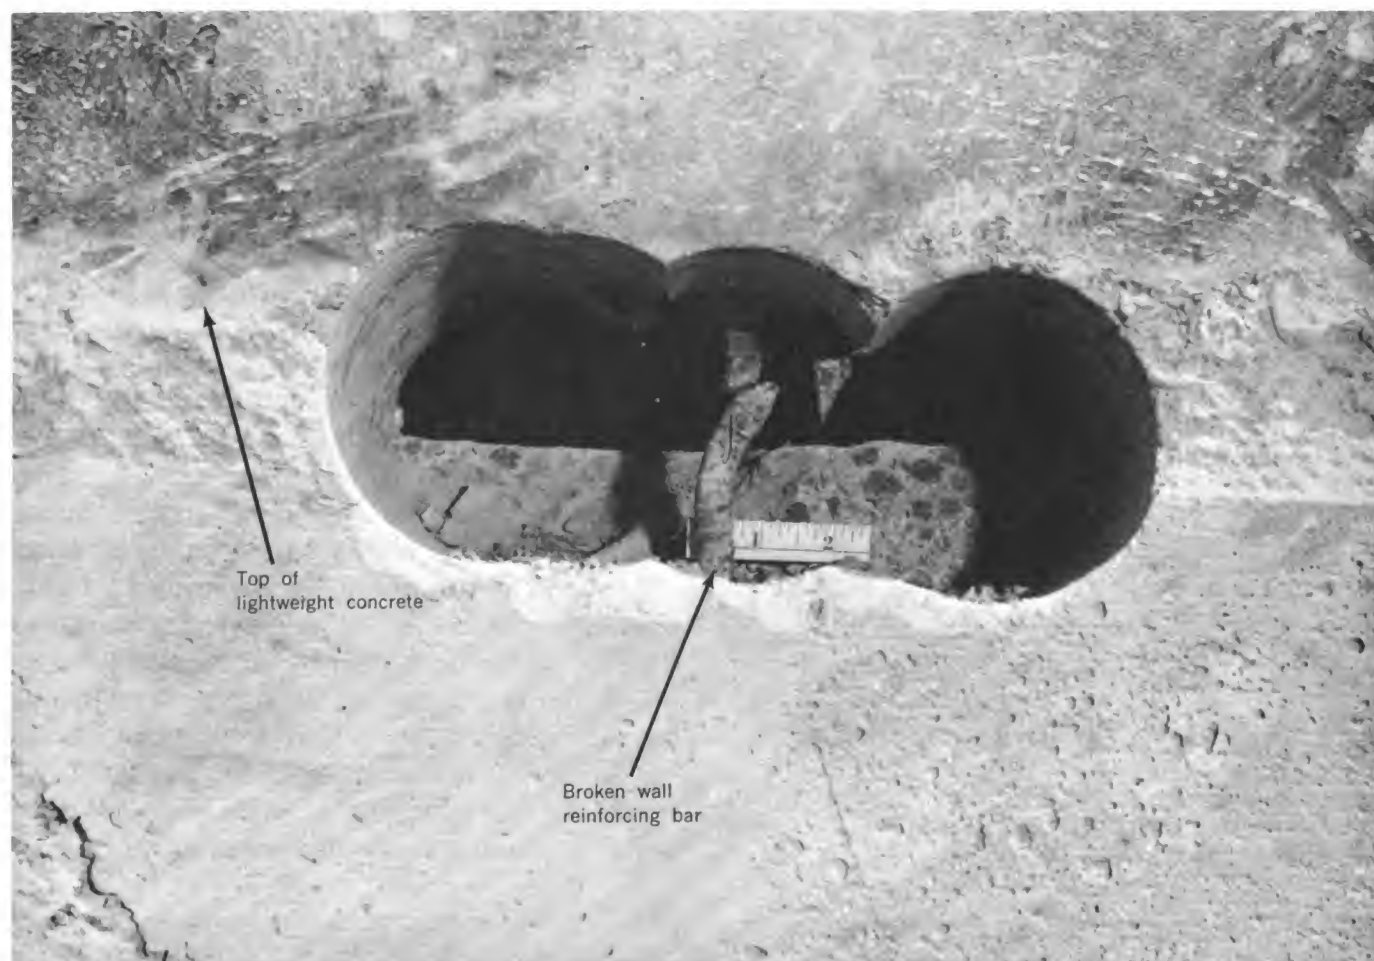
Museum for Antique Cars. Typical wall reinforcing bars at first floor in north wall. Note offset of upper portion of bar to right of lower portion.
